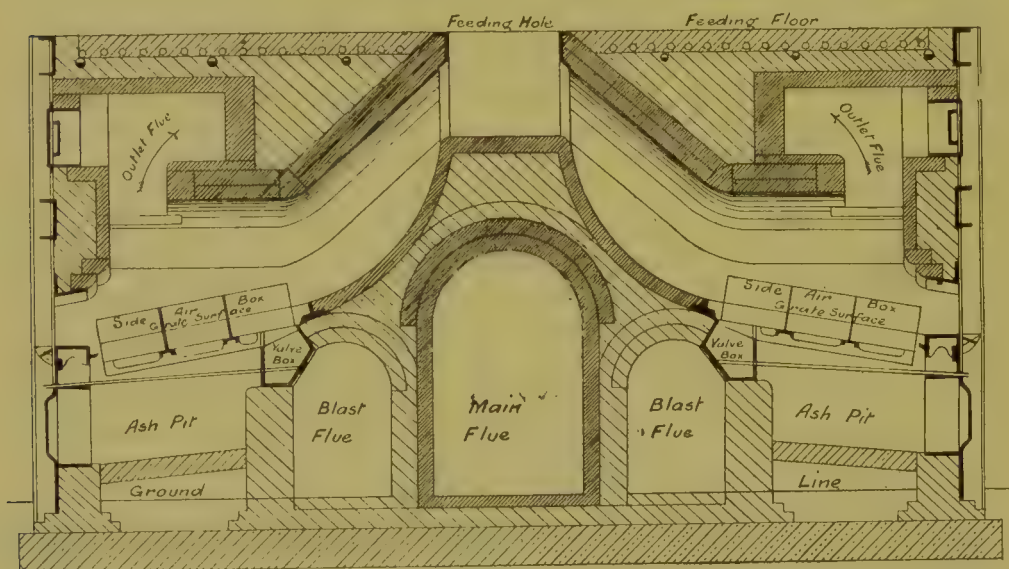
SECTION OF A BACK-TO-BACK HORSFALL REFUSE DESTRUCTOR.
